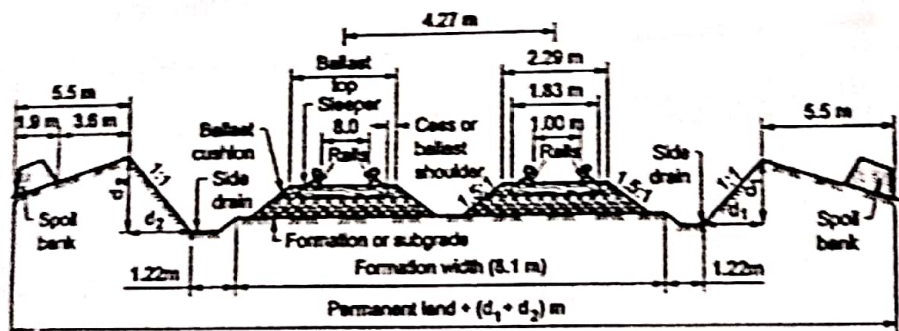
Cross-section of a double meter gauge track in cutting
